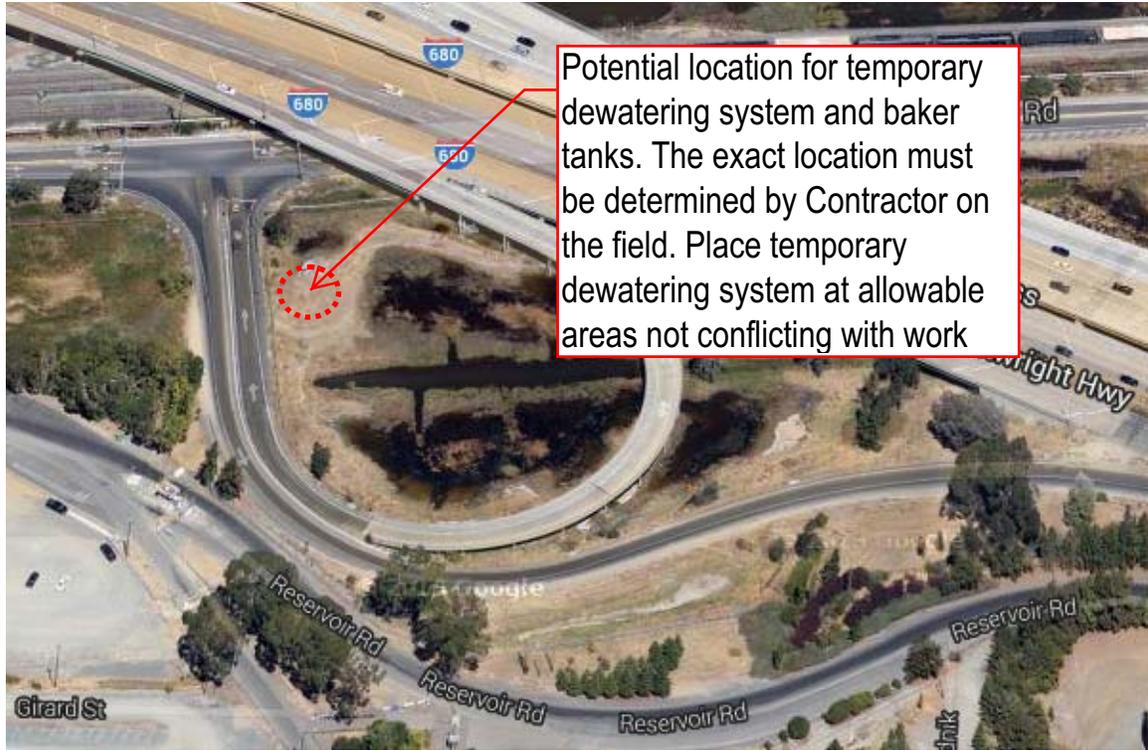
Potential Location for placing Temporary Dewatering System and Baker Tanks
